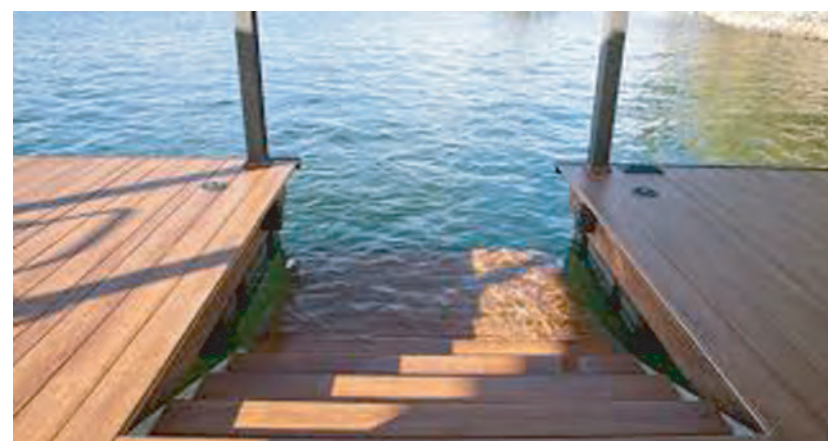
IMAGE: WATER ACCESSIBLE STEPPED JETTIES WITH COMPOSITE TIMBER DECKING
